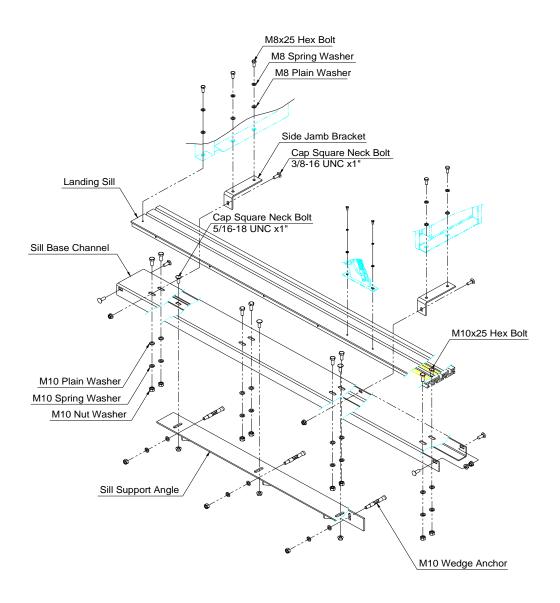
LANDING DOOR ASSEMBLY (TWO SPEED)
